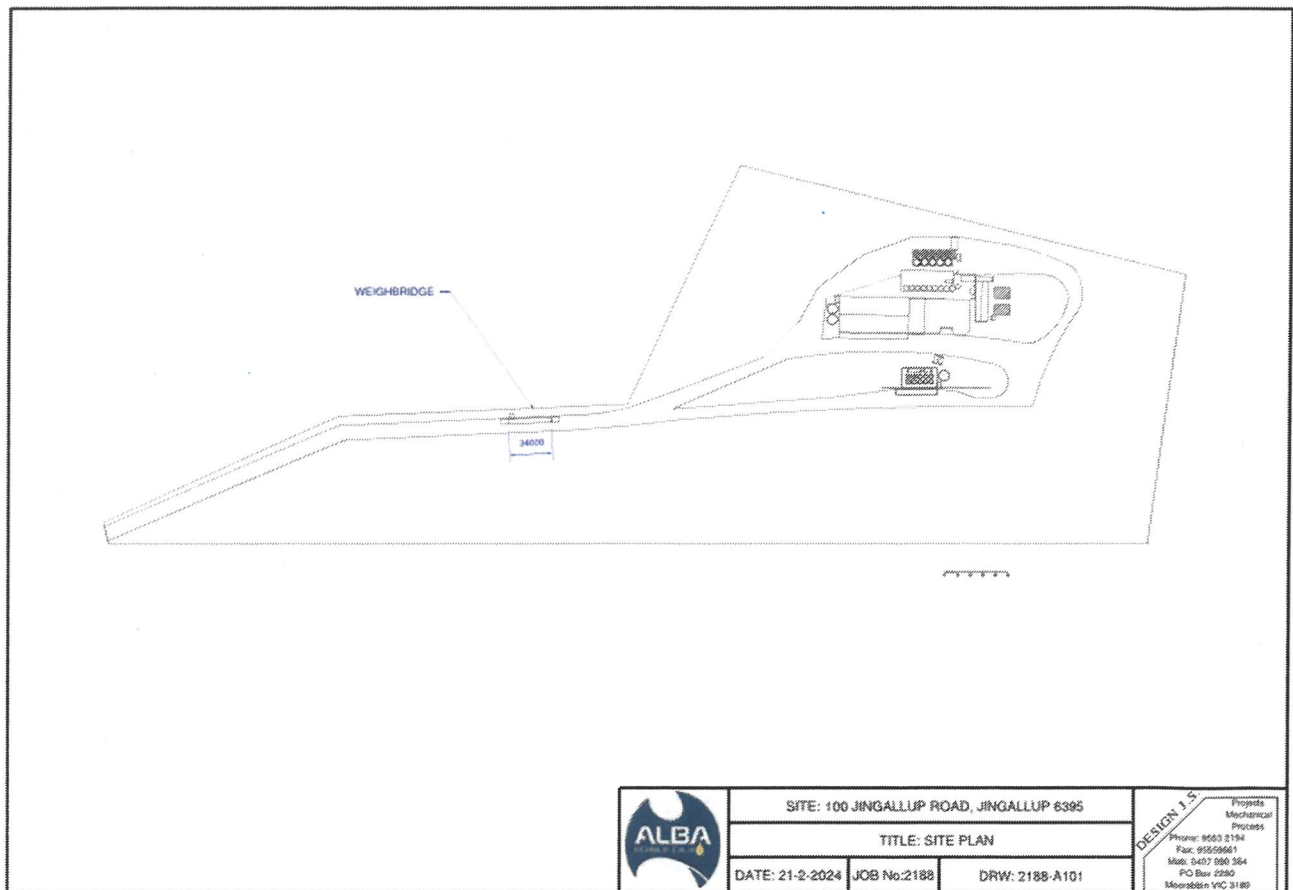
Proposed Site Layout – Farm Management Plan – Aus Oils Kojonup
